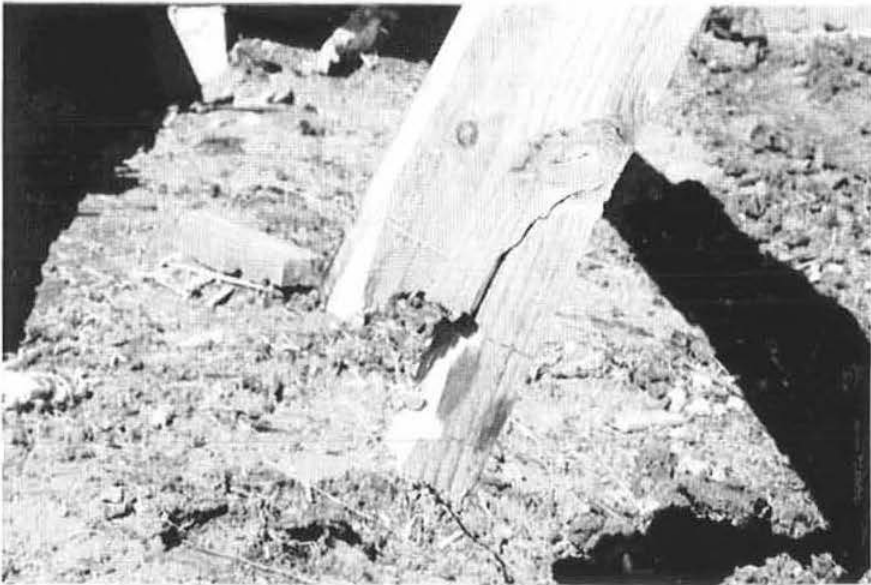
Typical Bridge Rail and Post Damage, Test LVBR-2
